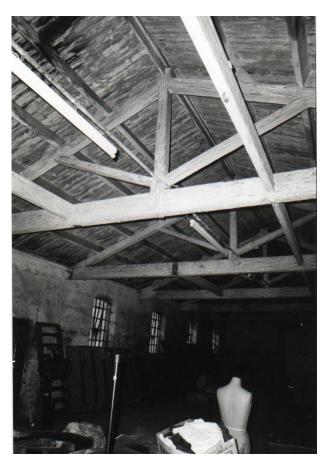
1975 photograph showing interior roof structure and sarking boards.
